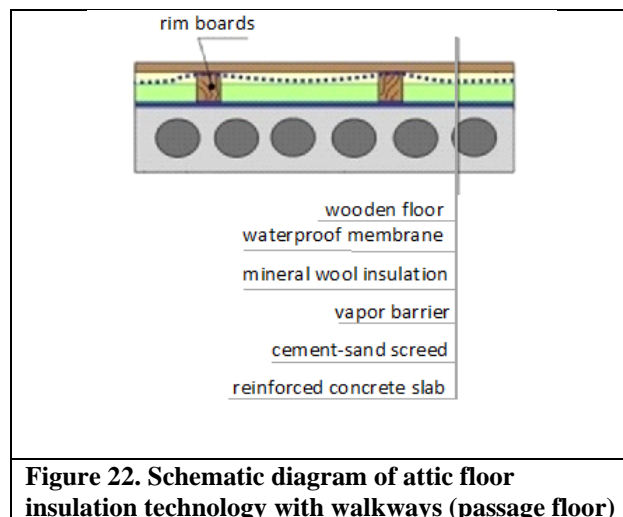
Schematic diagram of attic floor insulation technology with walkways (passage floor)
